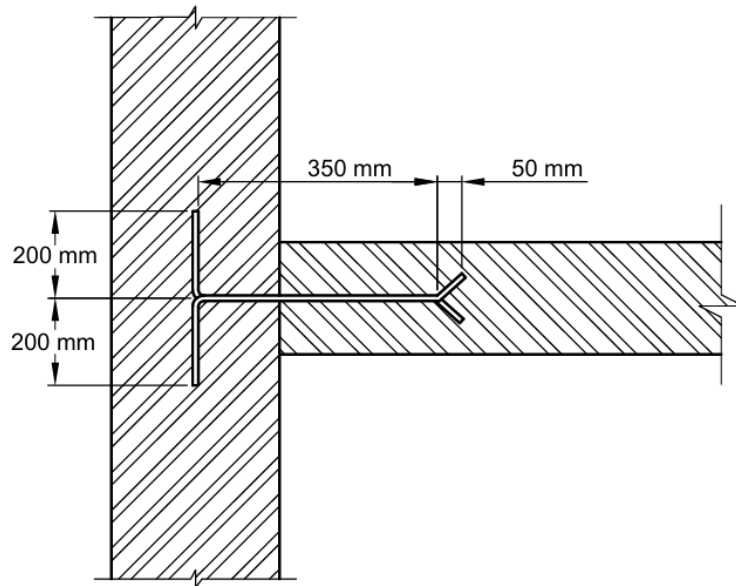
ANCHORING OF STIFFENING WALL WITH SUPPORT WALL
